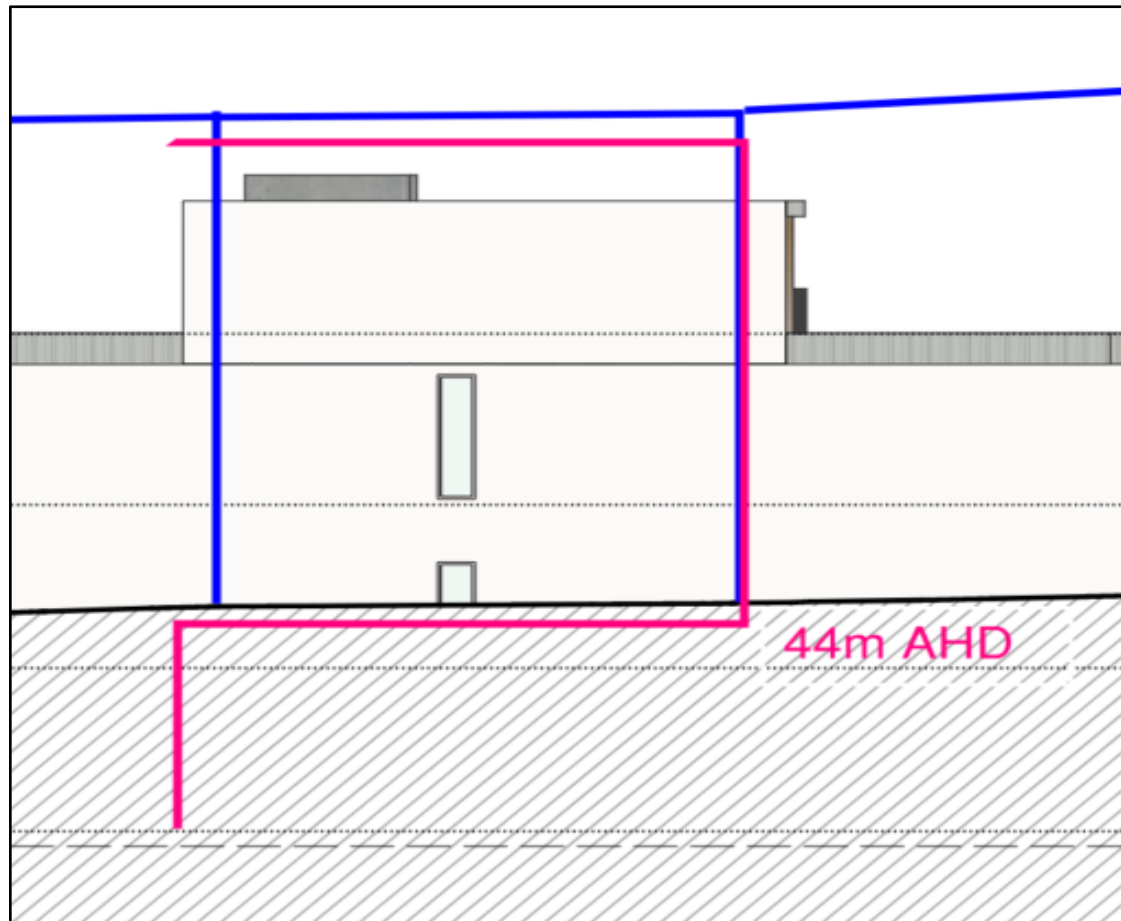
Building envelope as measured from 44m AHD, showing lift overrun and roof terrace to be within the building envelope as viewable from the East.
